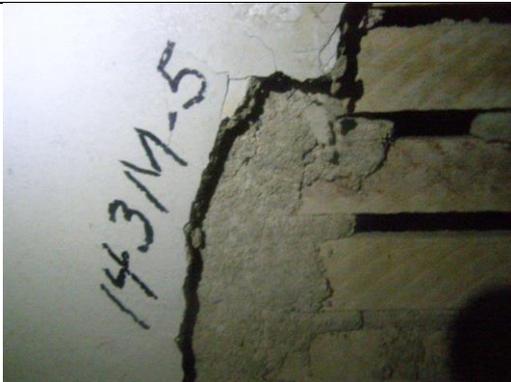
Plaster (143M-5) Dining Room, Wall A.
